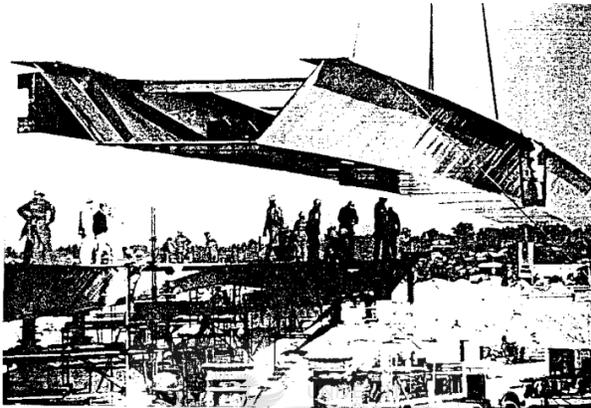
Large Girder Element being handled by Single 225t Crawler Crane
